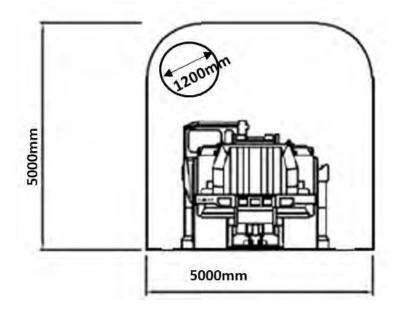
17 t LHD in a Typical 5 m by 5 m Ore
